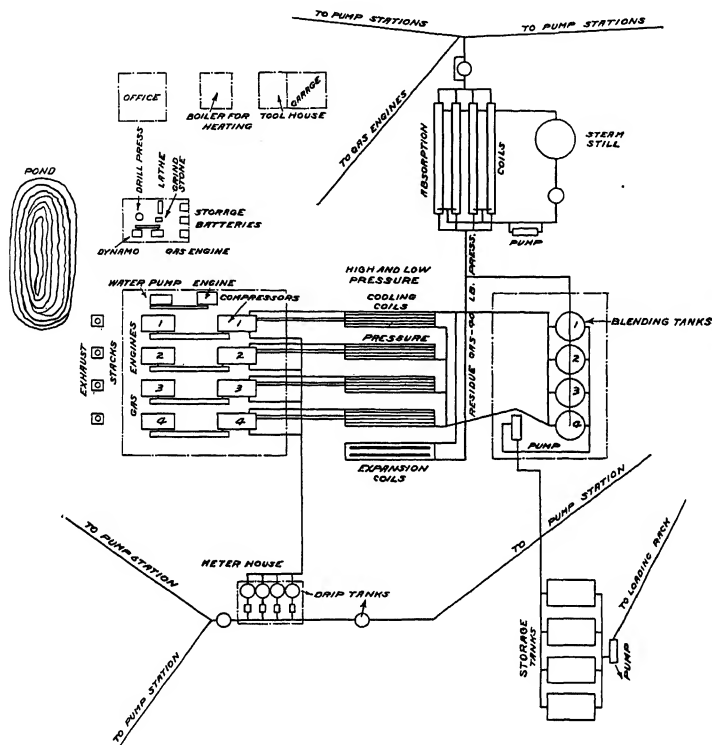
GENERAL PLAN OF GASOLINE PLANT. COMPRESSOR SYSTEM
